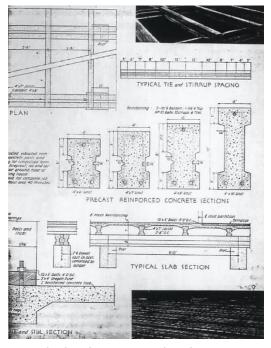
Plans for precast reinforced concrete sections in the VDL house, 1932.
